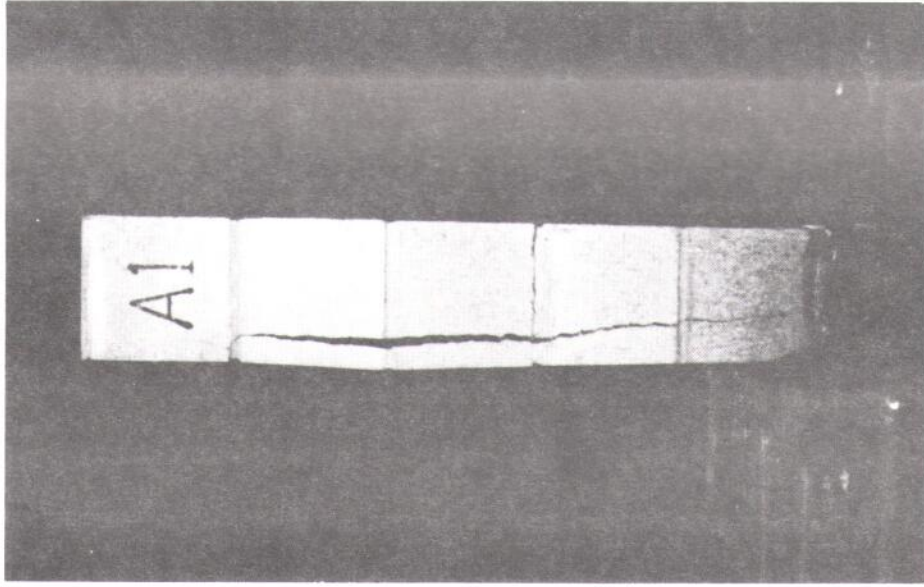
Failure of axially loaded solid concrete block masonry wall.
